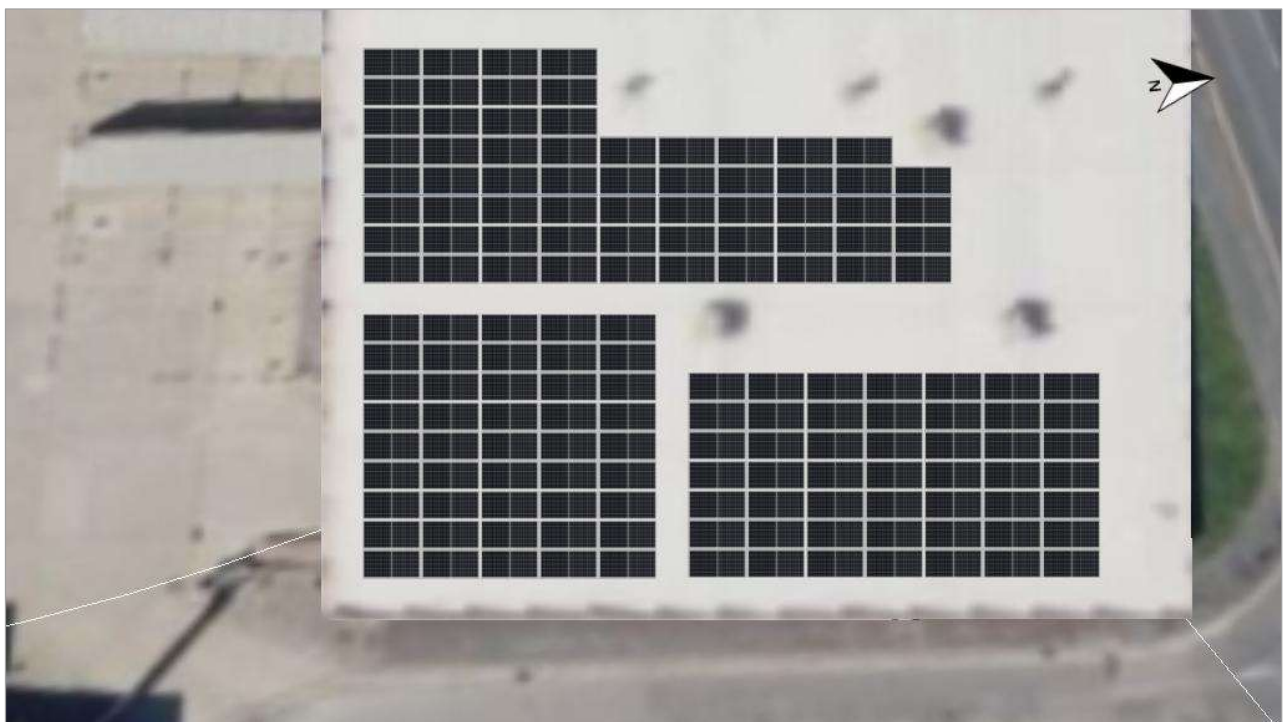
Module Area - Arbitrary Building 02-Mounting Surface East
